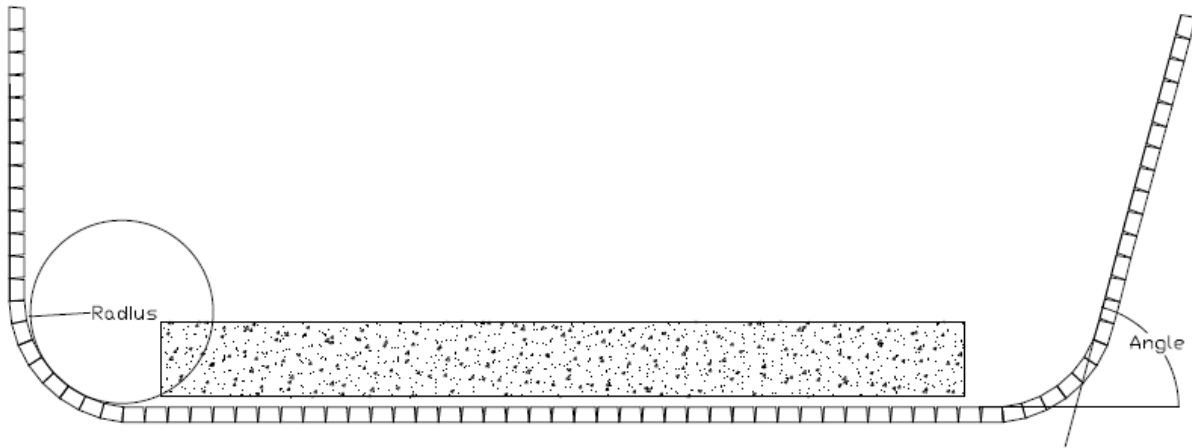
Photo. Alternative wing wall obtuse angle corner detail with CMU blocks.
